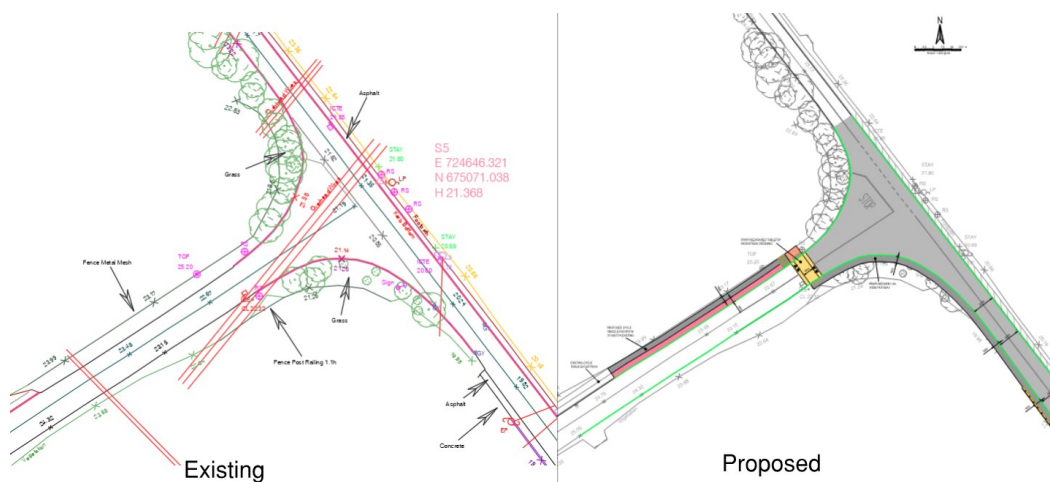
Extract from DOBA Engineering drawing C-0600 indicating proposed junction upgrade works
